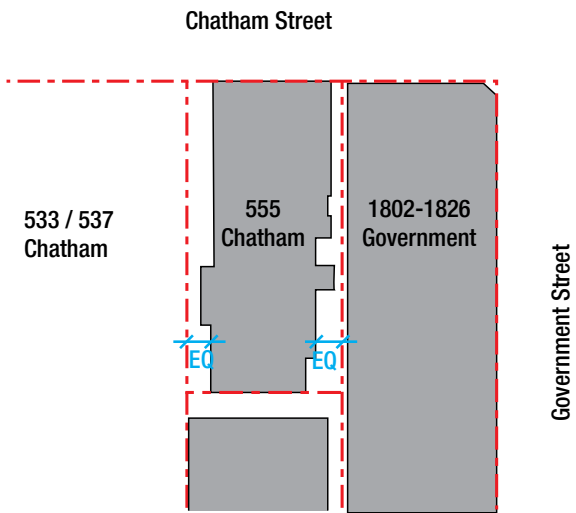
plan diagram illustrating the similar setback on the east and west property lines for 555 Chatham Street.
